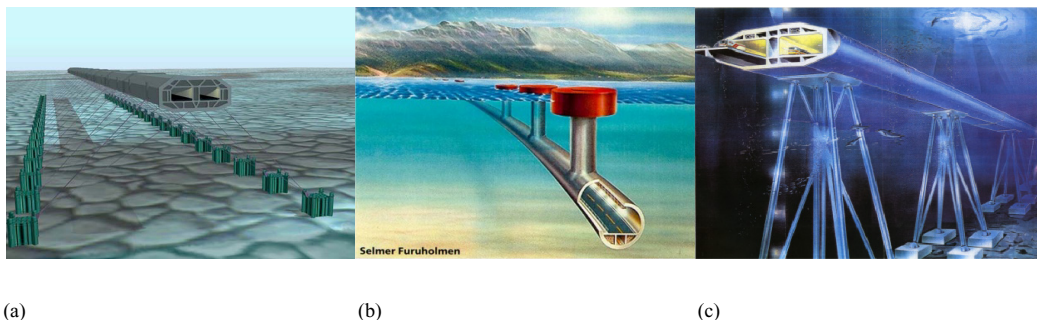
Supporting modes of submerged floating tunnel: (a) Anchor cable; (b) Floating drum; (c) Pile
